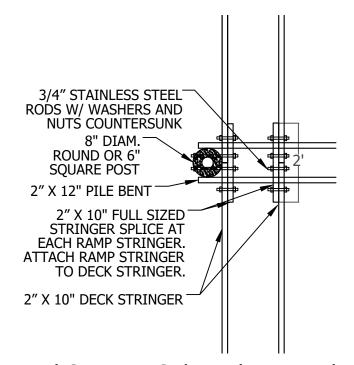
Observation Deck Plan View - South Dune Crossover Scale: 1 Inch = 2 Feet
